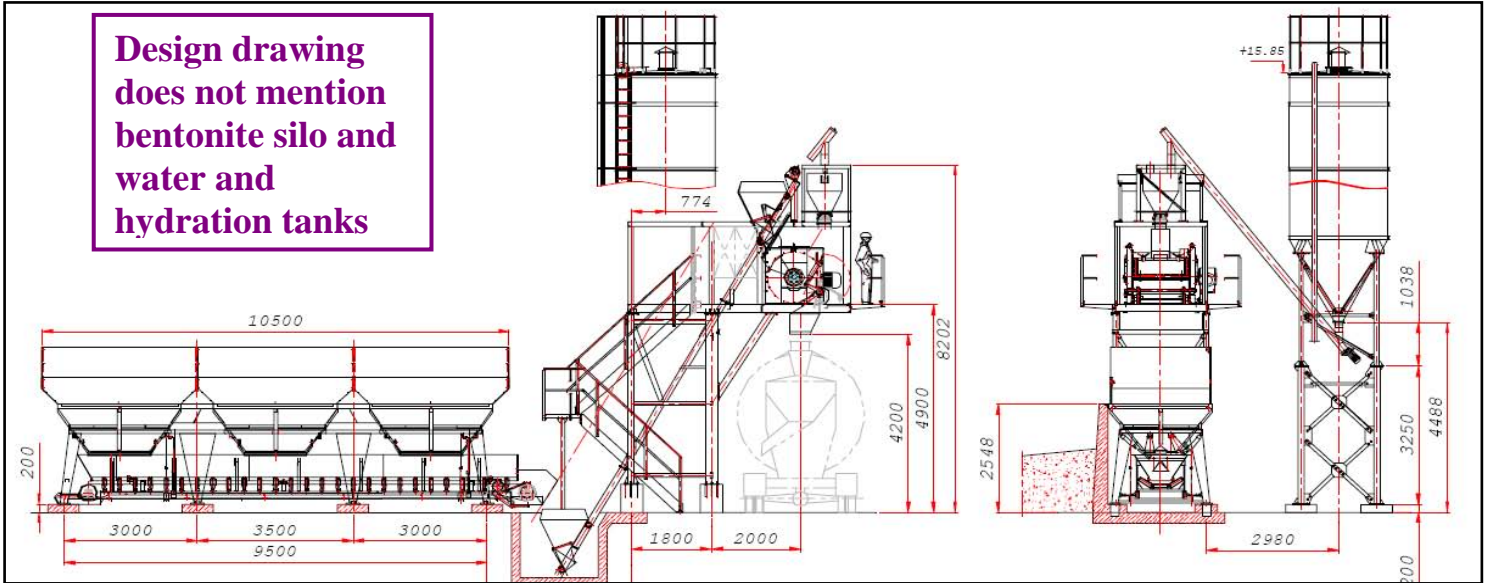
Contractor's design drawing for 30-m³/hour concrete-mixing plant
